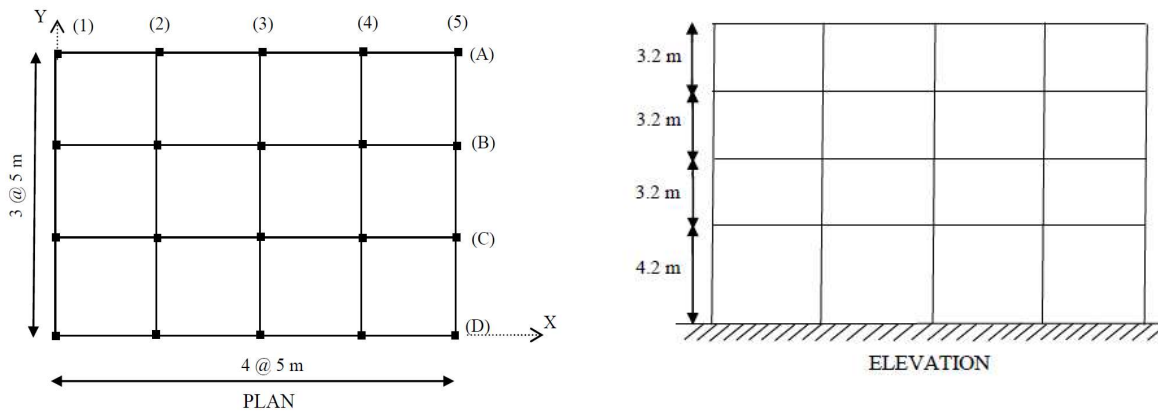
Plan and elevation of a four storey RC moment resisting frame
